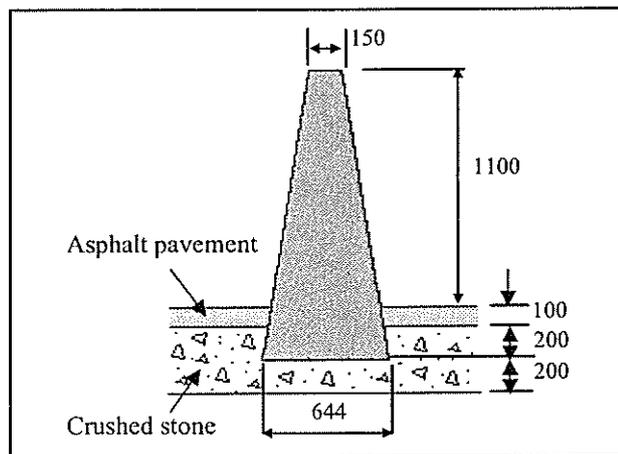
Cross Section of a Single-slope Concrete Guard Fence
